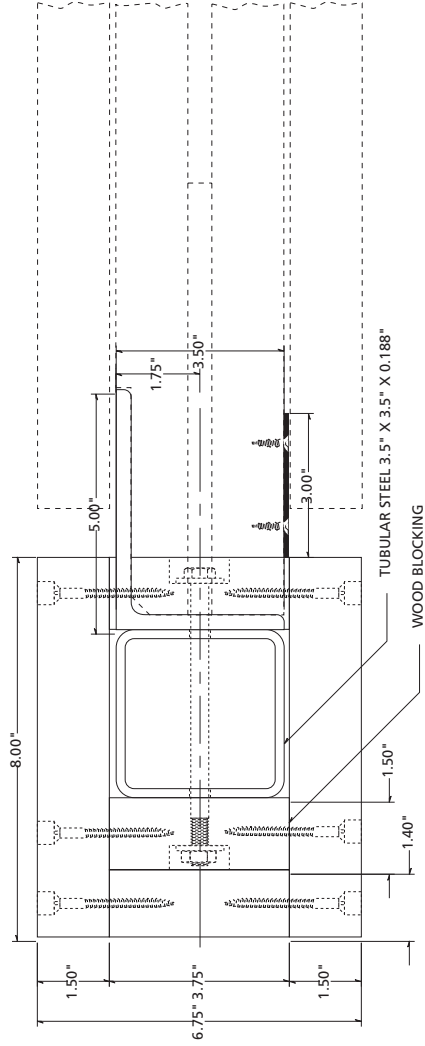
/2" x 3-1/2" x 3/16" POST ASSEMBLY FRONT ELEVATION
